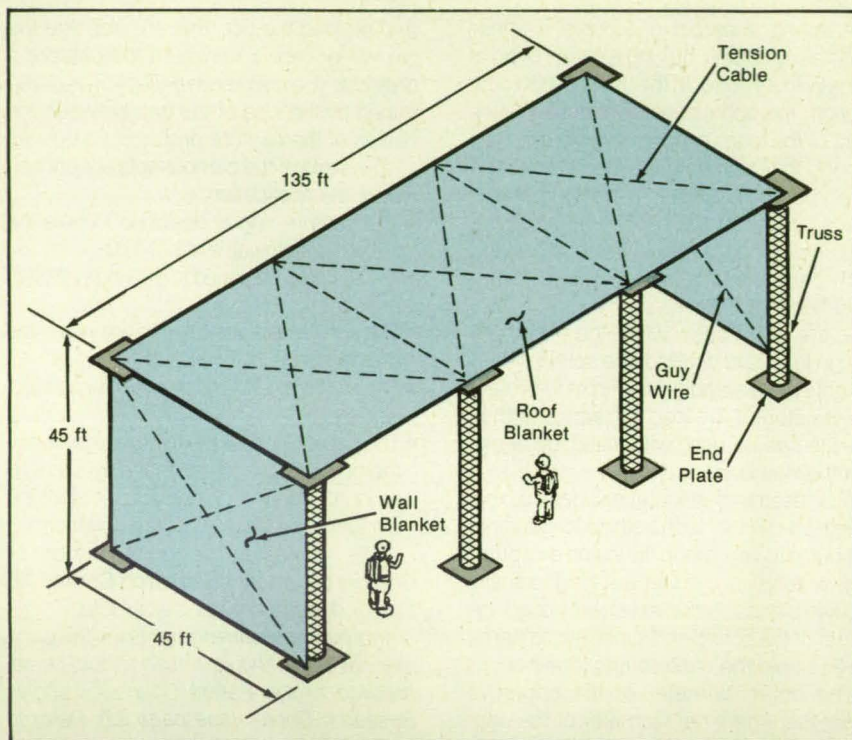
The Fully Deployed Structure would provide a large, unobstructed bay. The deployed trusses would support wall and roof blankets.
